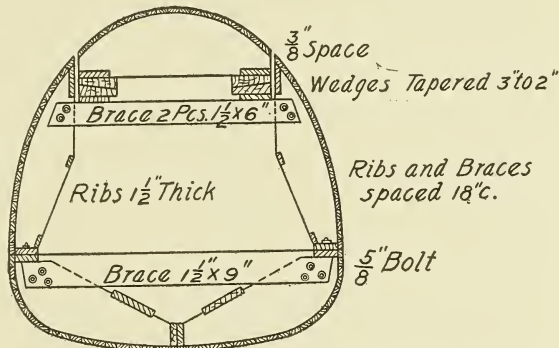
Form for Construction of Horseshoe-Shaped Concrete Conduit.
